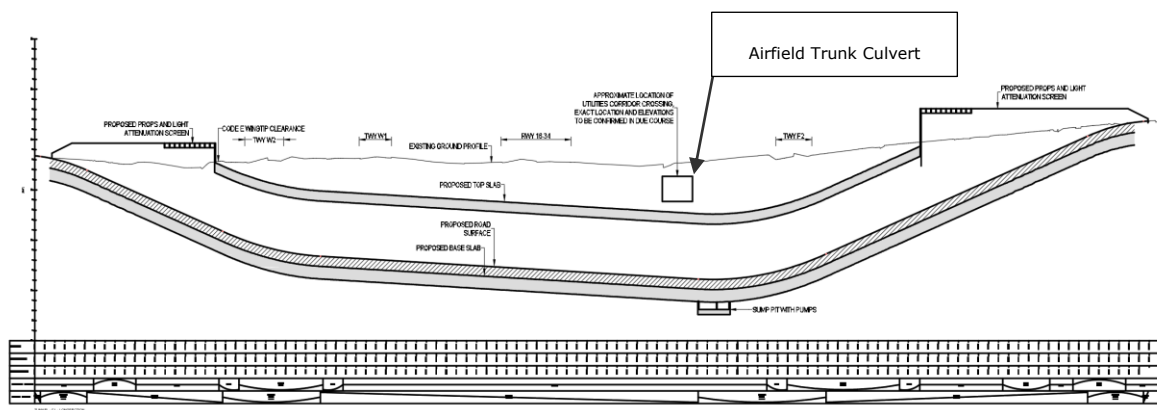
Underpass Alignment Long-section with Airfield Trunk Culvert Interface
